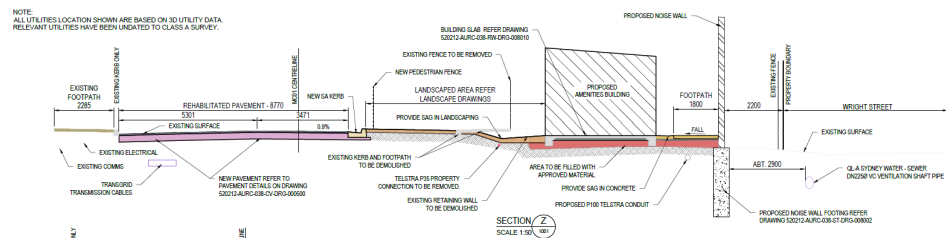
Typical cross section at chainage 173 Burrows Ave
